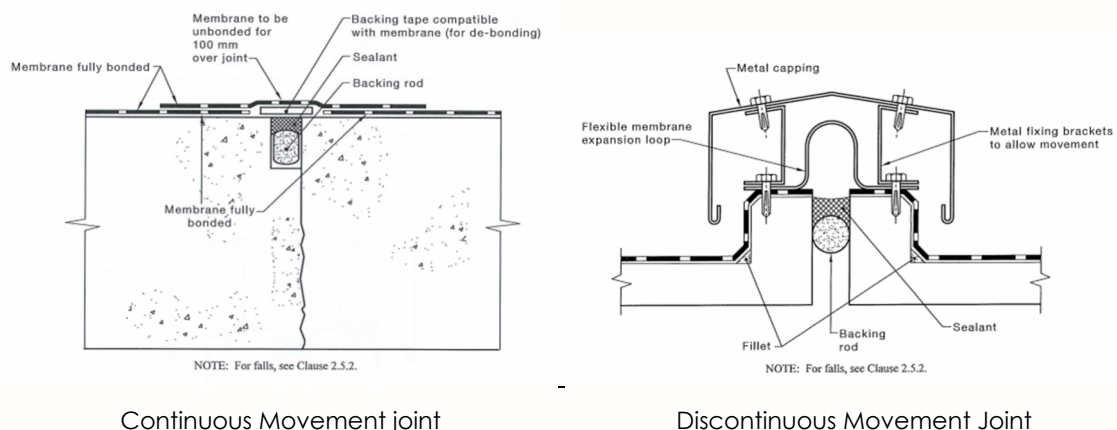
Movement & Control Joint Details (Source: Section 2.9 of AS 4654.2-2012)
